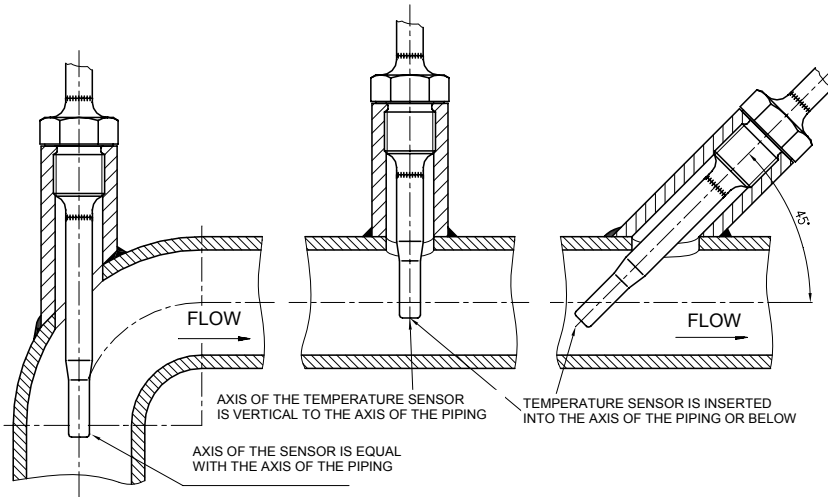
Examples of installation of direct and angular weld-on pieces pursuant to ČSN EN 1434-2
